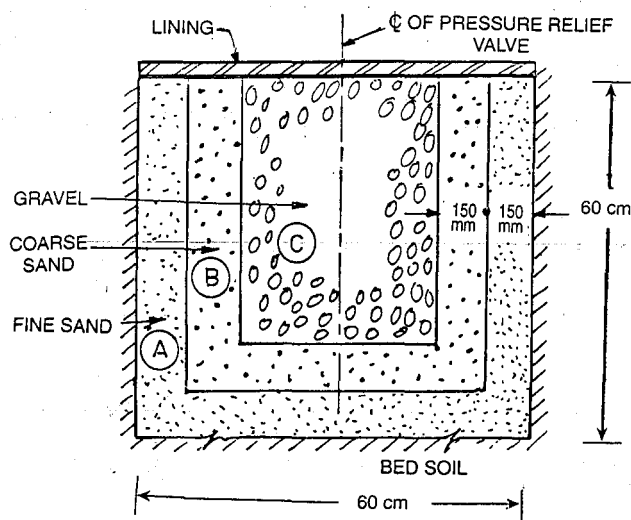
Details of graded inverted filter to be used in drainage relief pockets.
